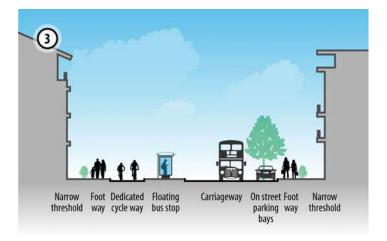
Indicative Street Section 3: Primary Street, West Ashton.
